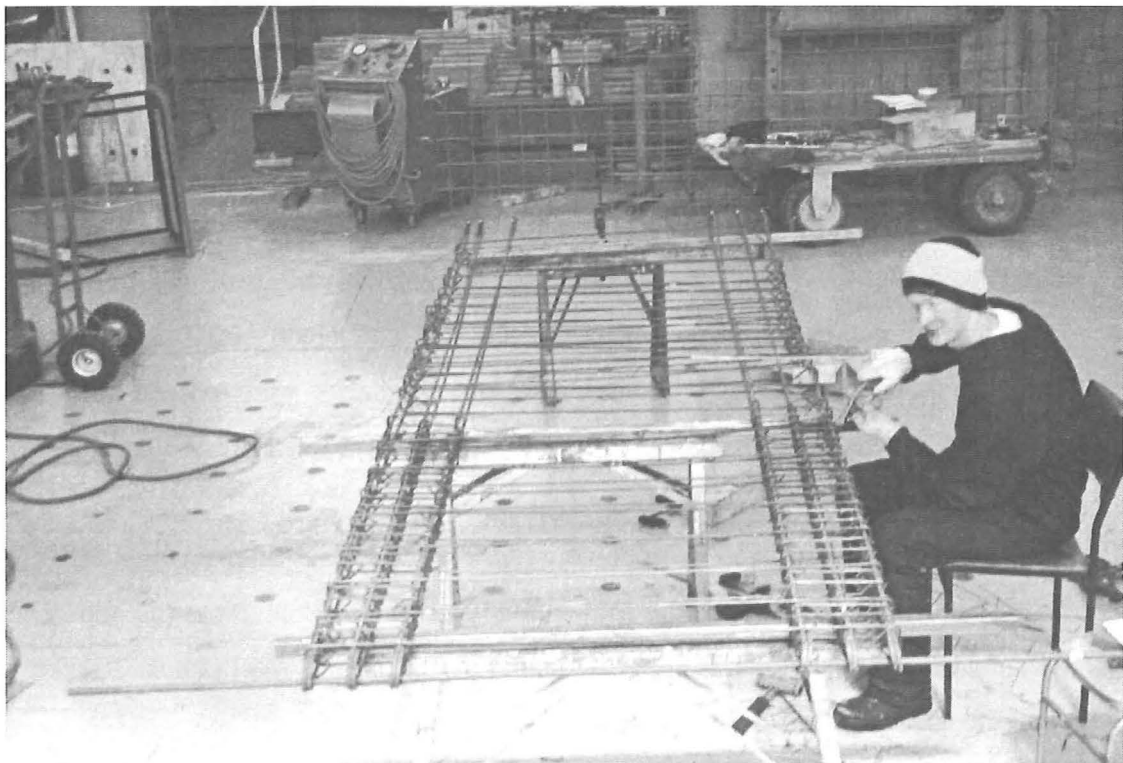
Reinforcing cage of the wall for Unit 1 mid-way through the steel tying operation.
